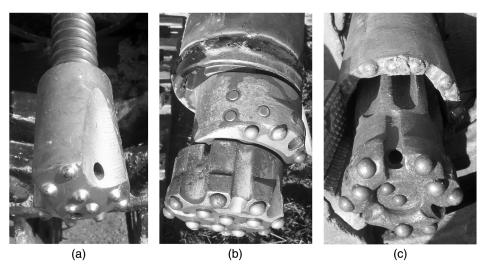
Pictures of different drilling systems and drill bits used in field test. (Images by Einar John Lande.)
